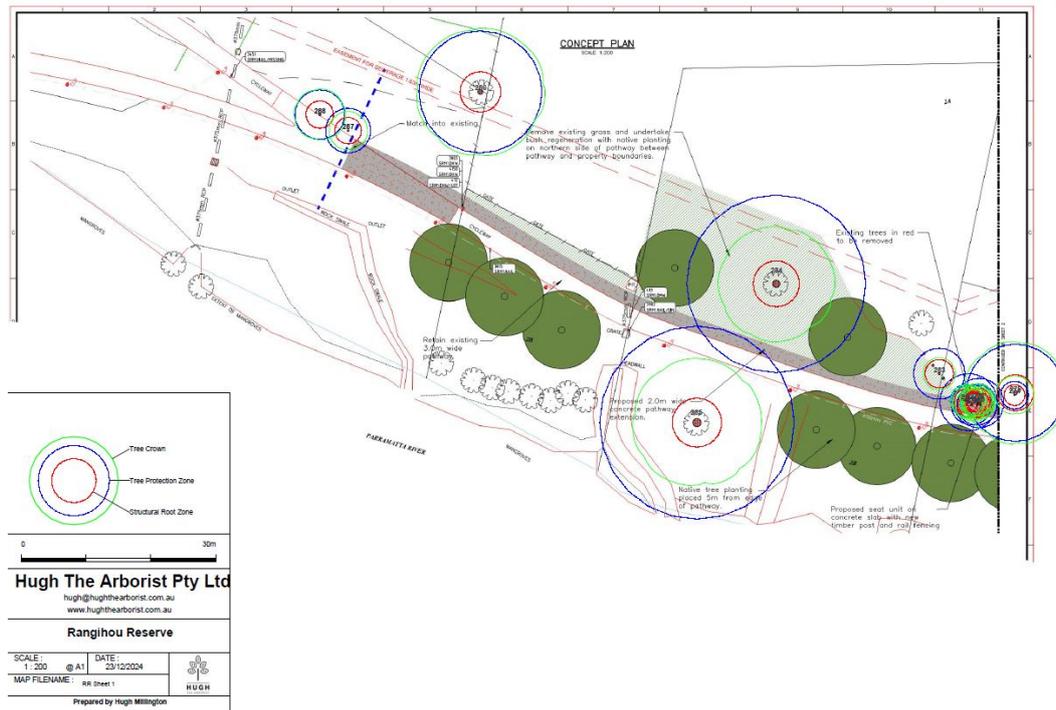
Site Plan (Sheet 1). Source: Hugh The Arborist
